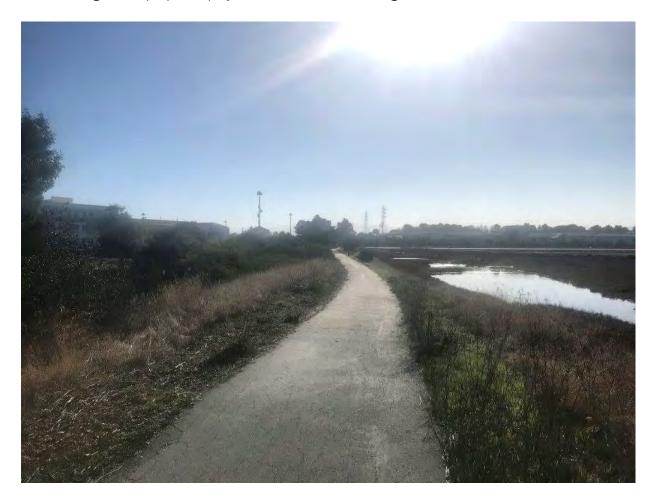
View from paved Bay Trail at the eastern limit of proposed Reach 3, looking west. Highway 84 is at the left; tidal Pond R3 is to the right. The proposed project would construct an engineered levee at this location. Oyster shells would be placed in Pond R3 to enhance breeding habitat of the Western Snowy Plover.
